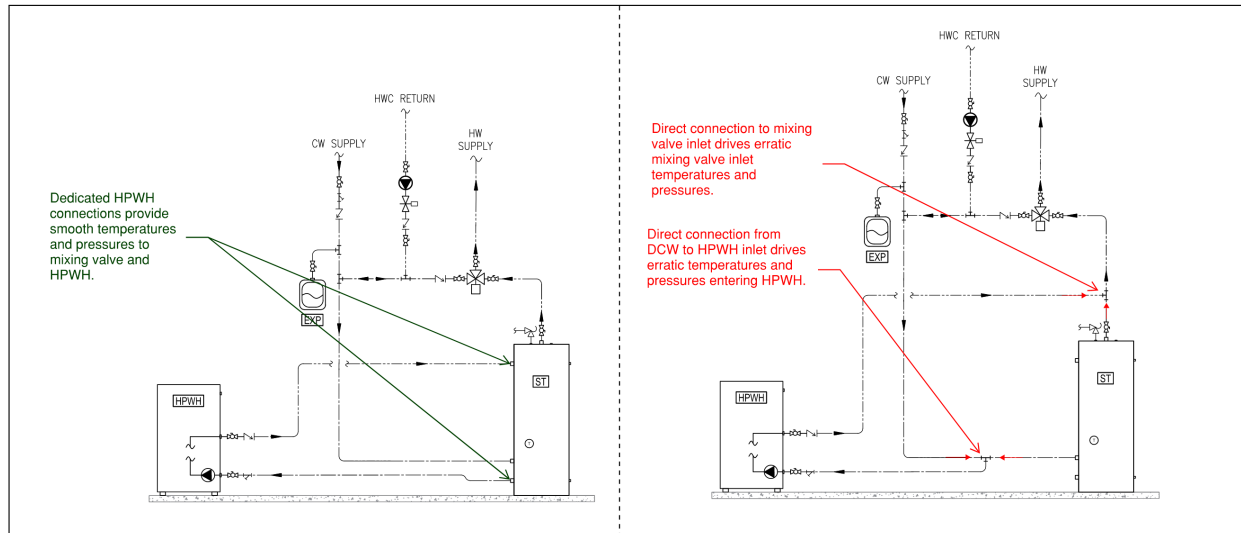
Left: dedicated tank connections for HPWH inlet and outlet provide hydraulic separation. Right: HPWH inlet and outlet are piped to mixing valve inlet and DCW make up, driving erratic HPWH and mixing valve behavior.
